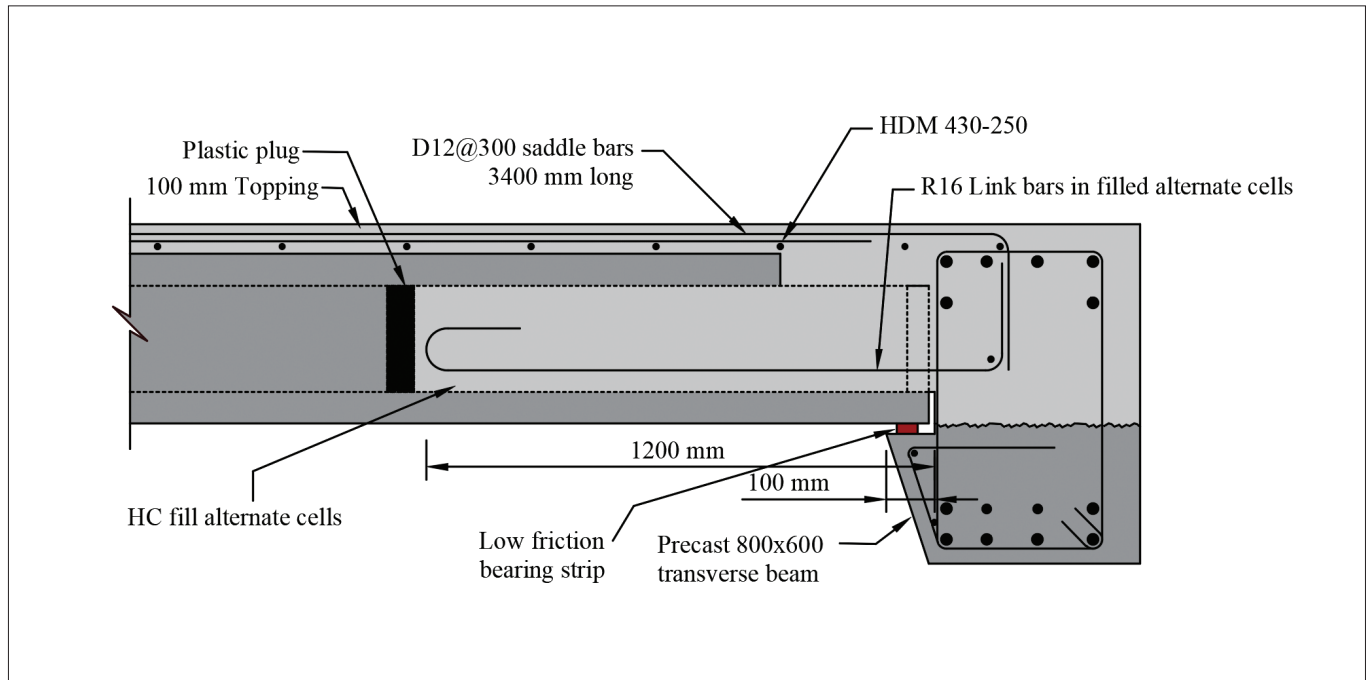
Schematic of floor to beam connection detail (dark grey colour indicates precast portion)
